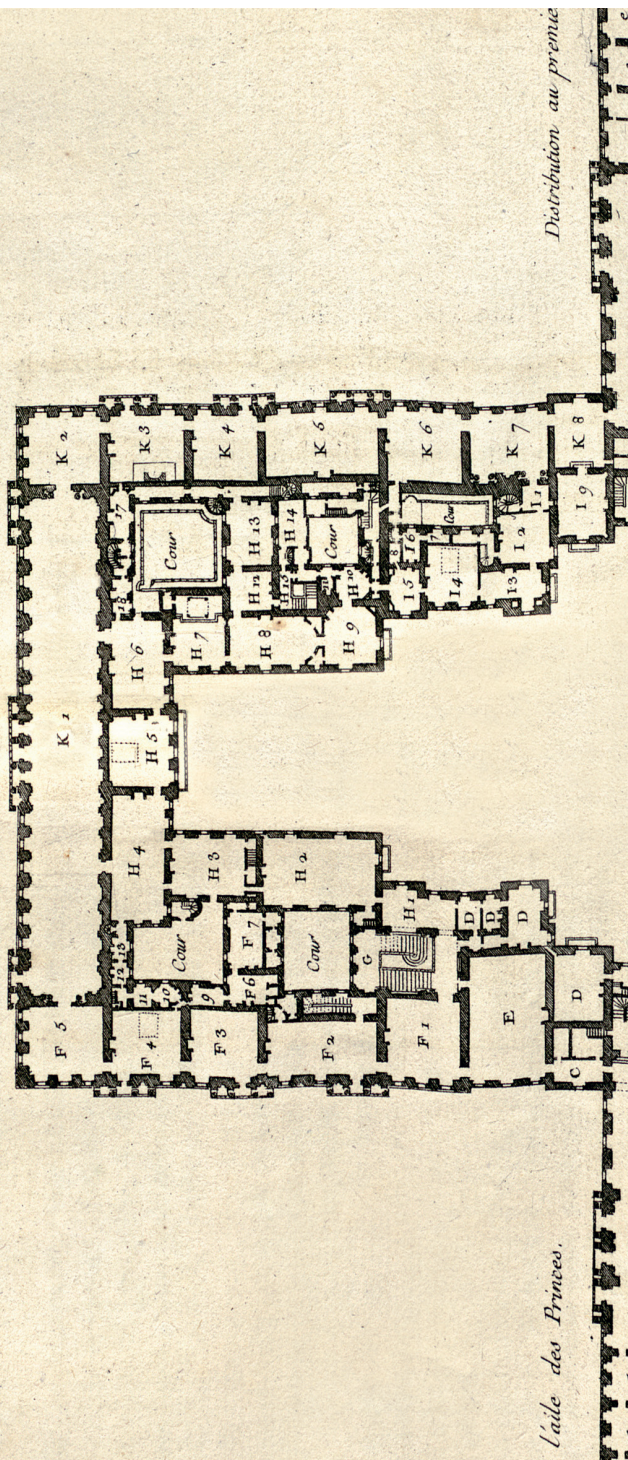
Versailles, floor plan of the upper floor (detail), published in the fourth volume of Jacques-François Blondel's *Architecture Française* of 1756.
